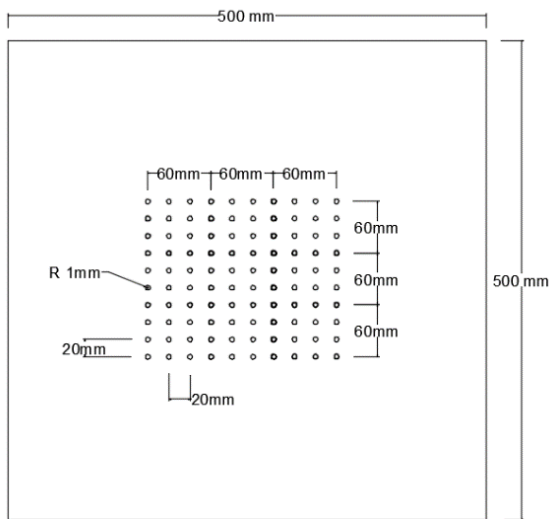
Sketch for the models of depth 60 mm for configuration where micropiles are installed under the footing to depths 1B and 2B
